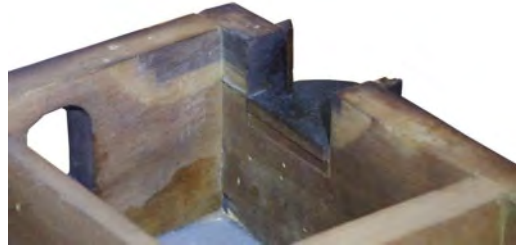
Dovetail connection of the outer walls. Second floor model section of the northern building (source: the authors).
